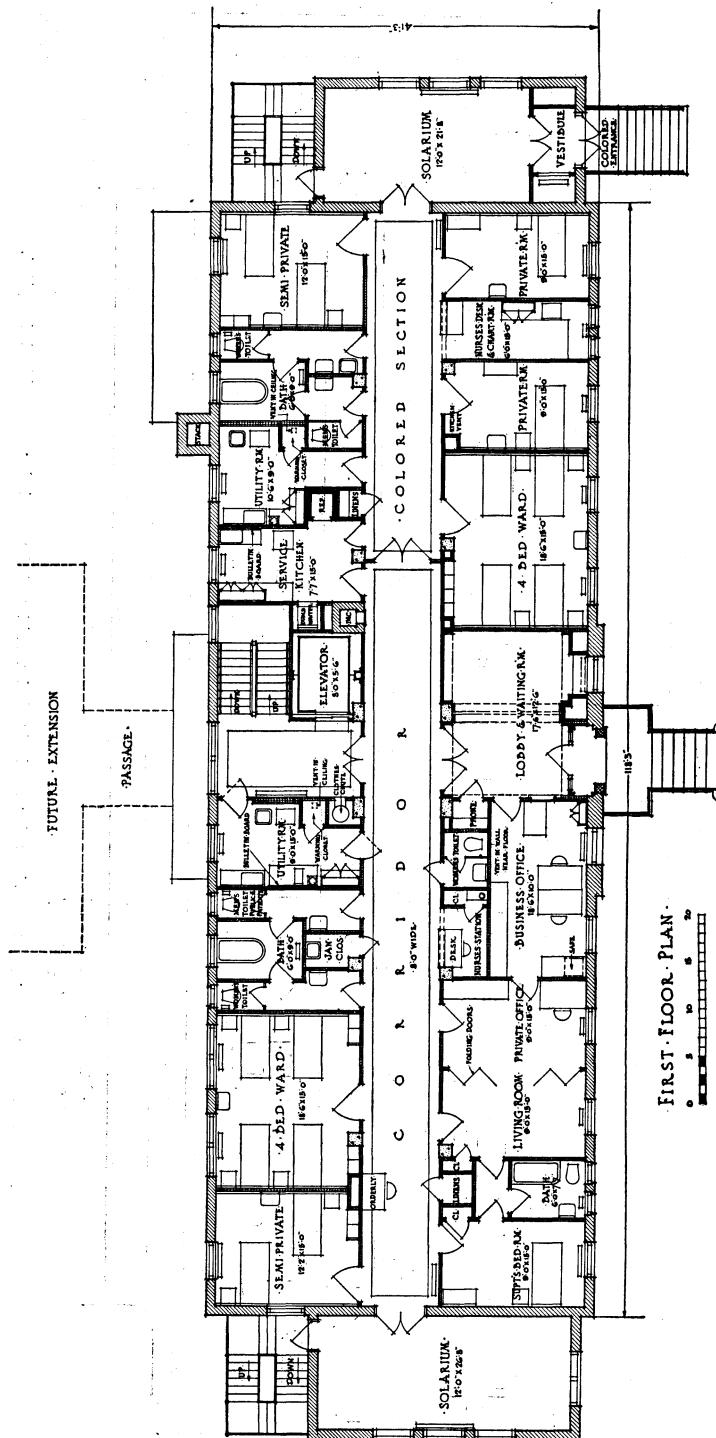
This floor would be used in the 25-, the 35-, and the 46-bed building.
